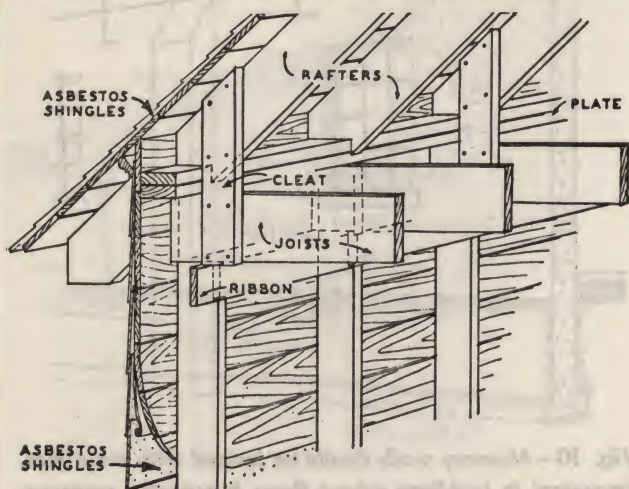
In existing structures the rafters can be tied to the joists with a cleat. This permits flush ceilings.
